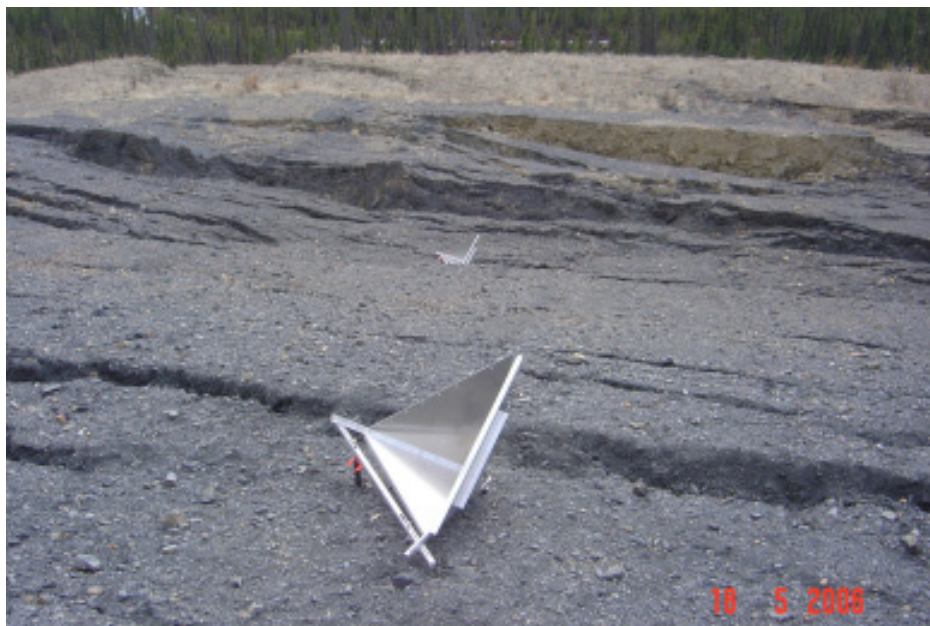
Reflectors 1 and 2 installed along the slope at Beaver Creek, Site 1. View looking downslope from the highway.
